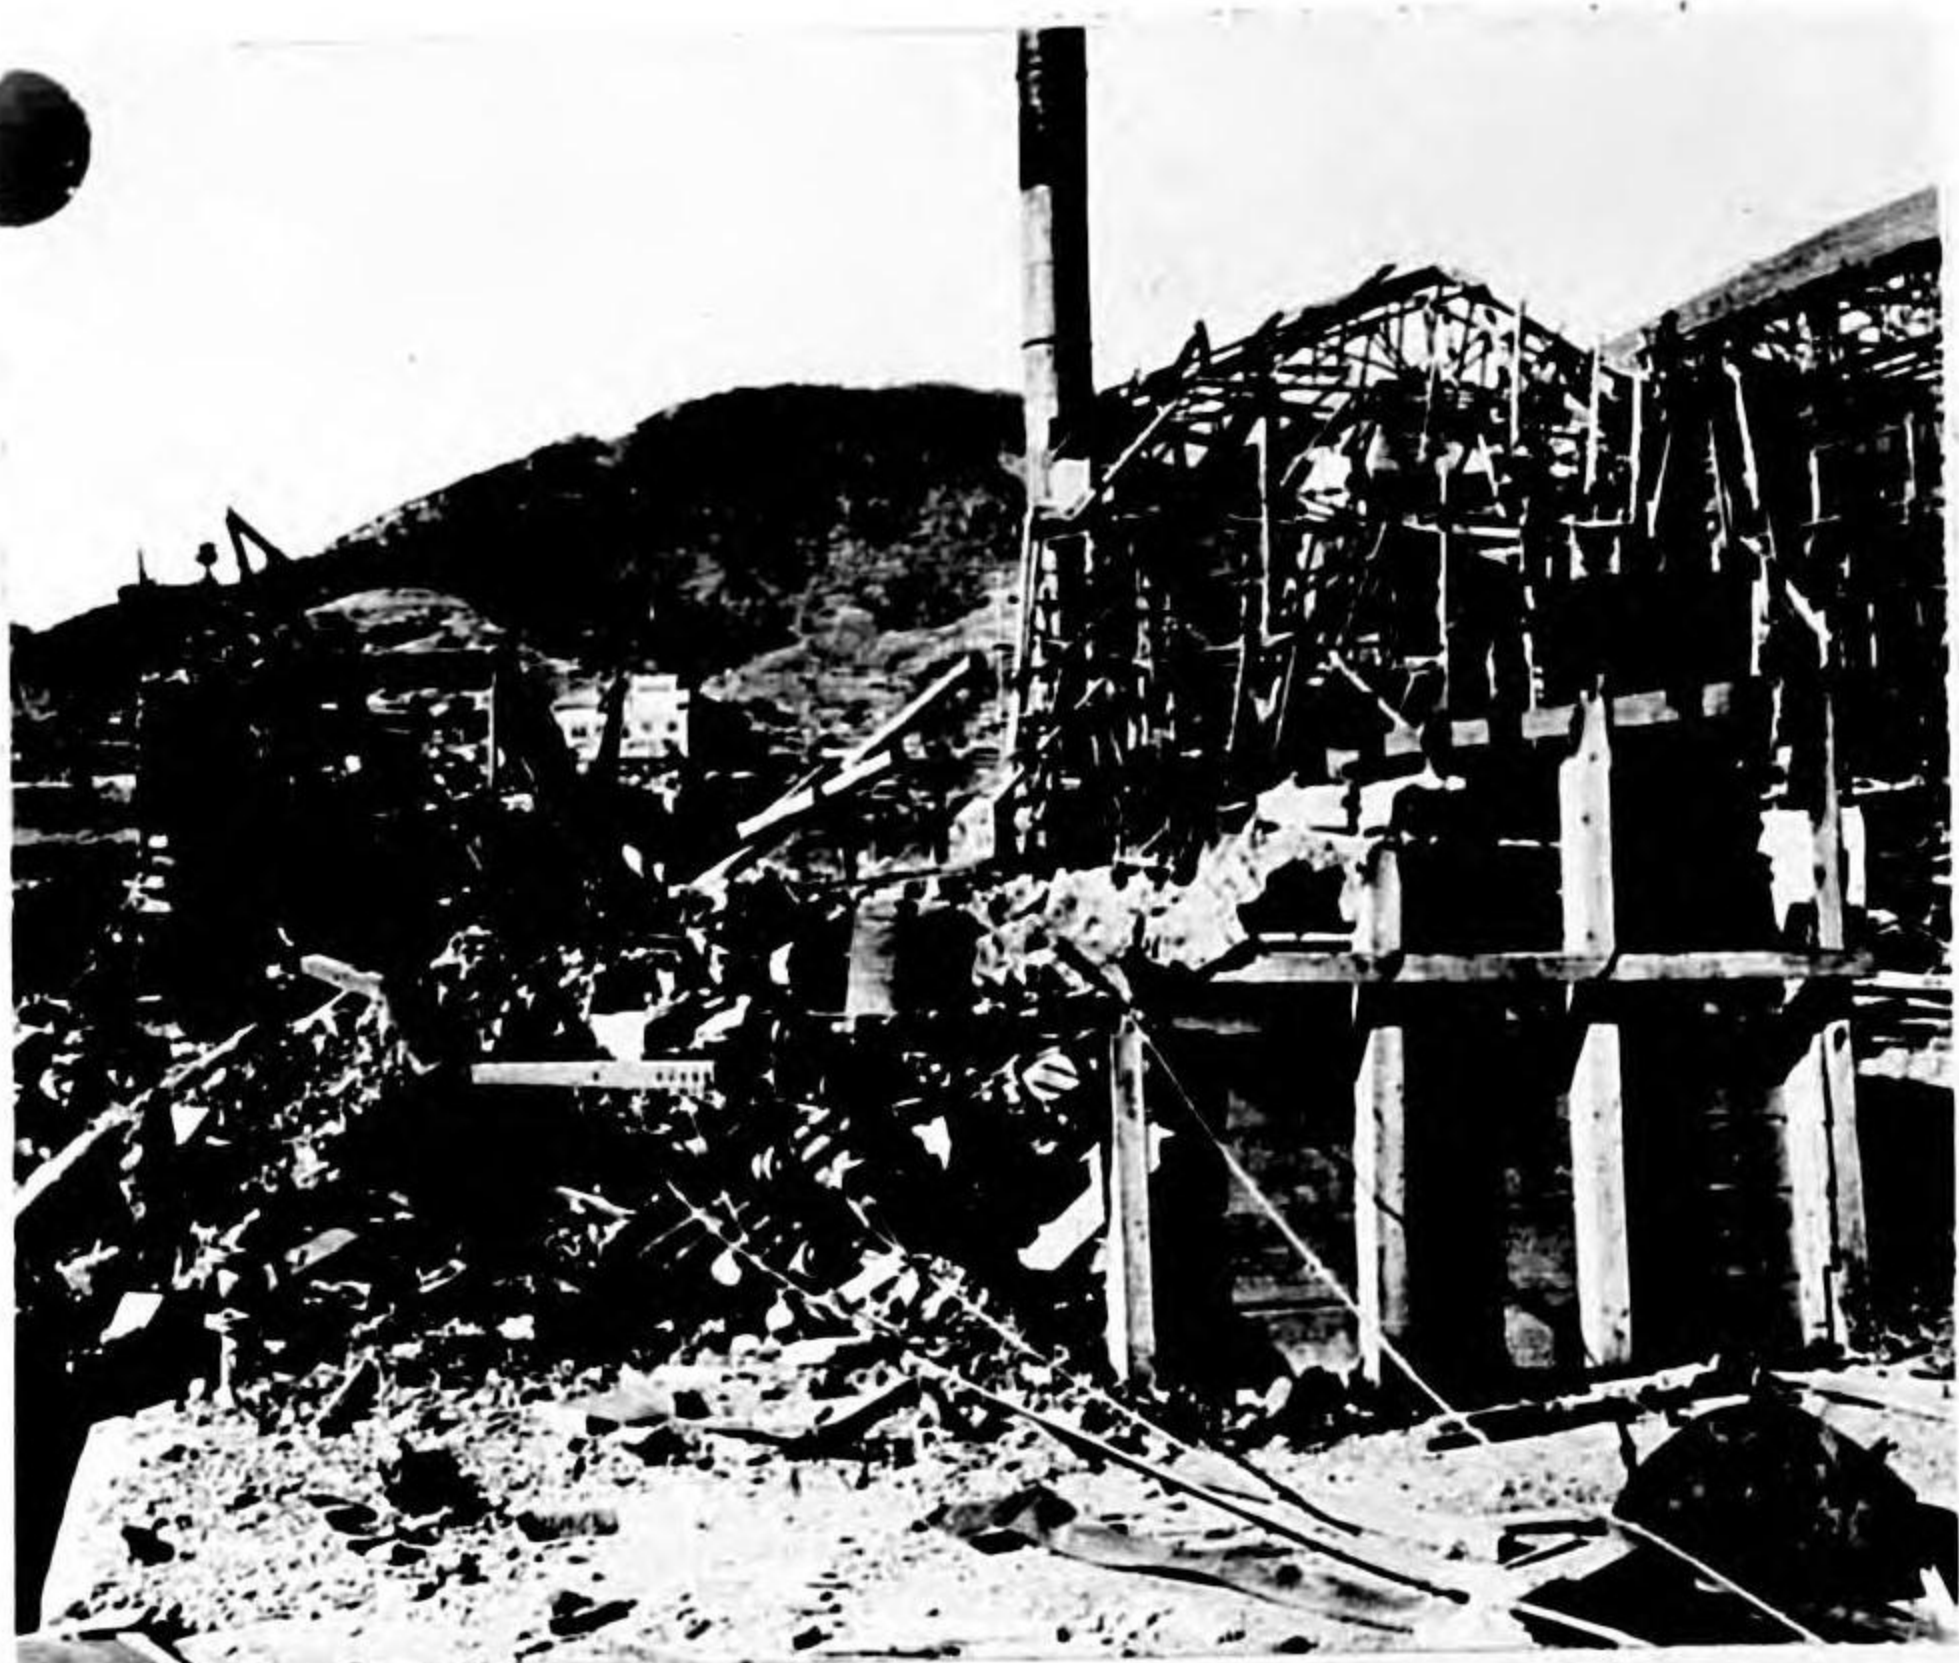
Nagasaki. Wood-frame building housing substation, 5,800 feet from GZ, 100 per cent structurally damaged by blast.
